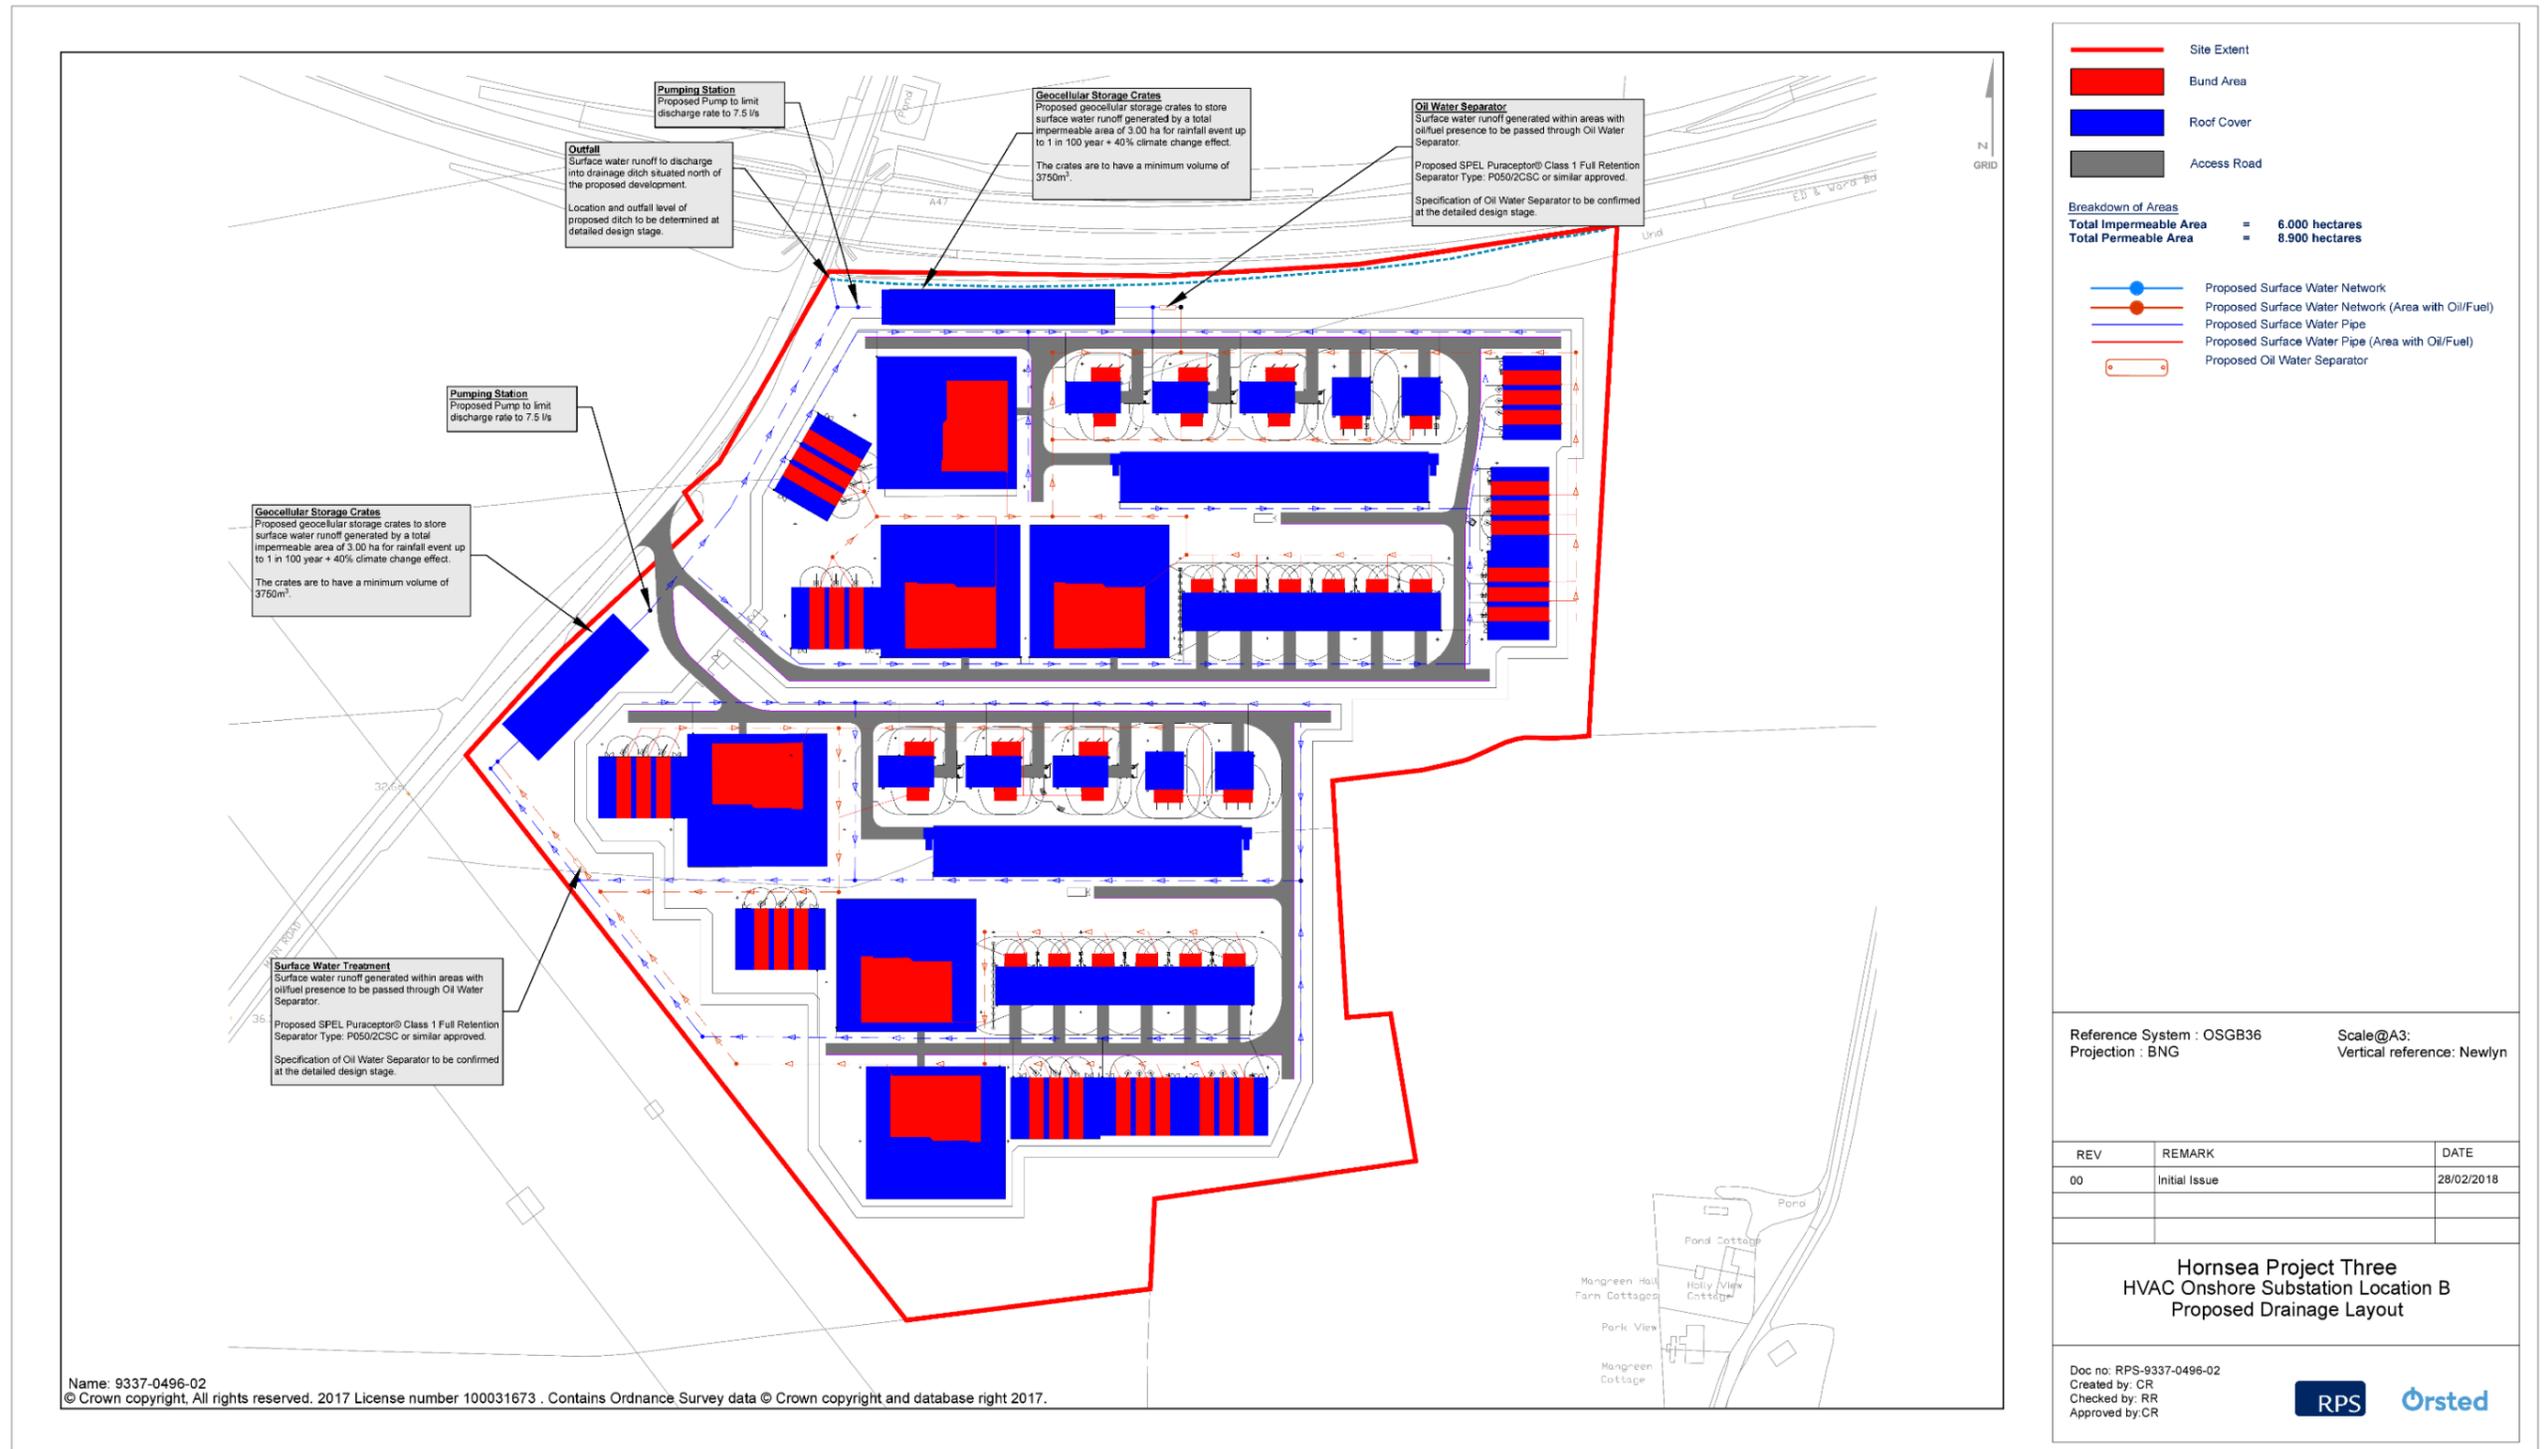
Onshore HVDC converter/HVAC substation – Proposed Drainage Layout.
